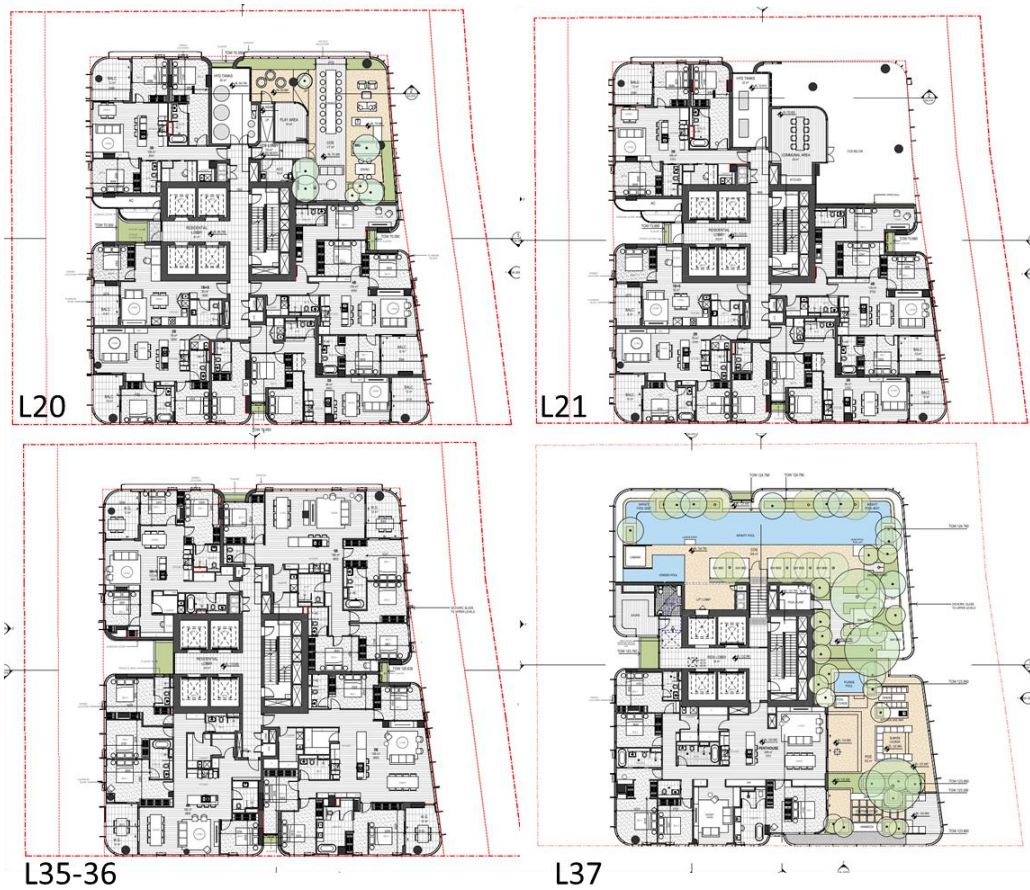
| Proposed Floor Plans (Source: Applicant's Architectural Plans)
